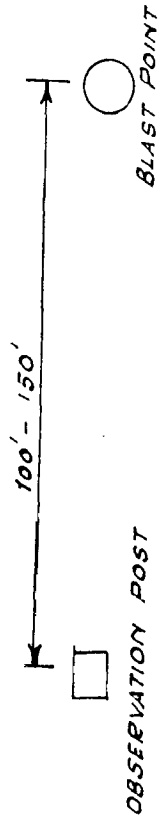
(a) SITE PLAN OF BLASTING AREA
